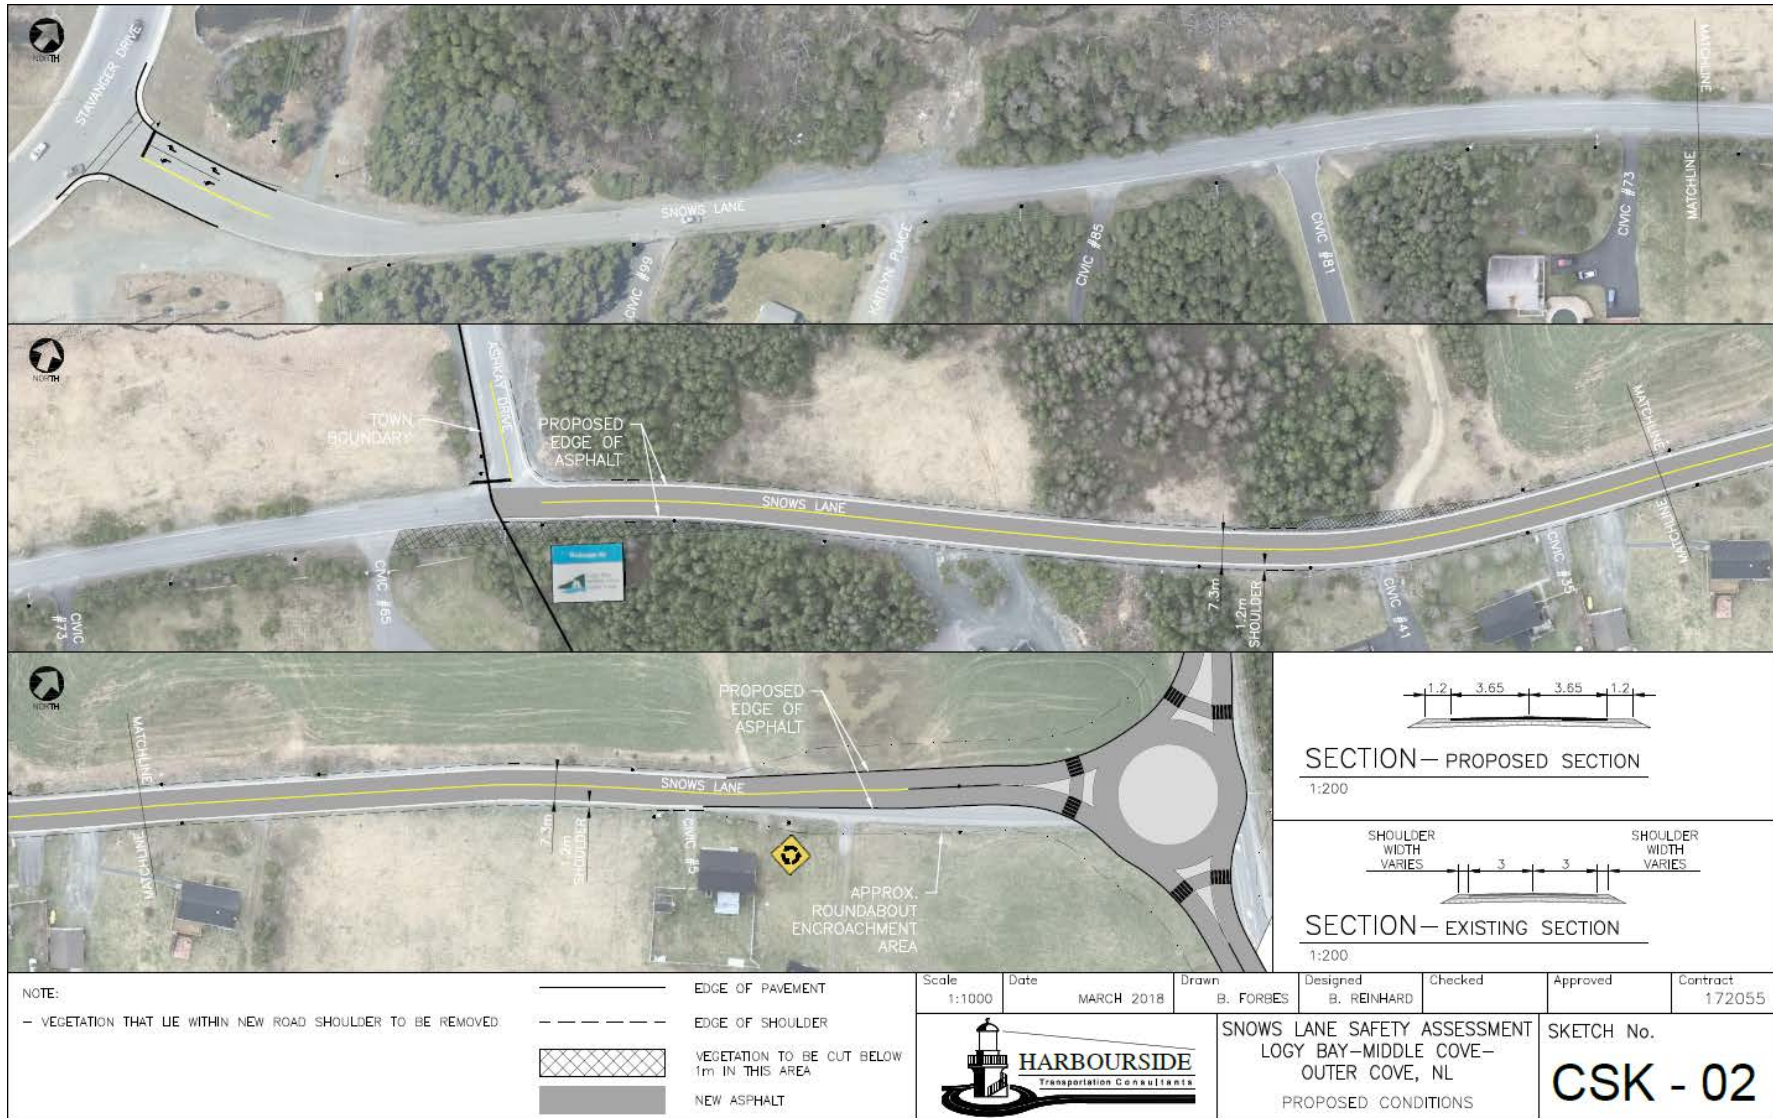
Plan view of proposed signage and pavement markings on Snow's Lane
